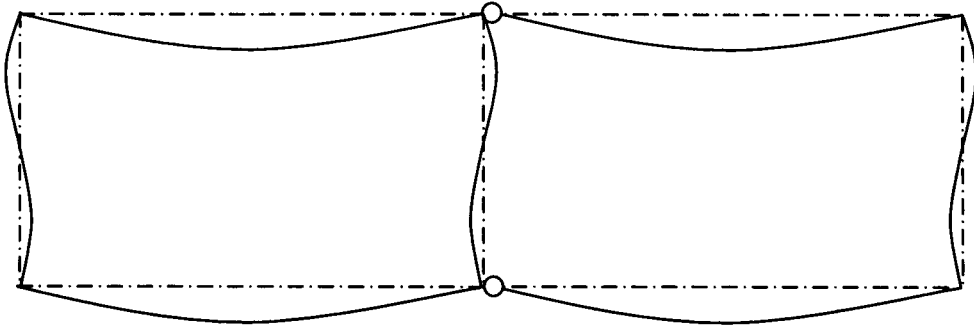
Column end-rotation equal to beam slope, simply supported beams
